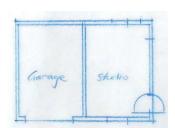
Floorplan of 1956 garage sketched by Geoff Ashley (2016, p32).
